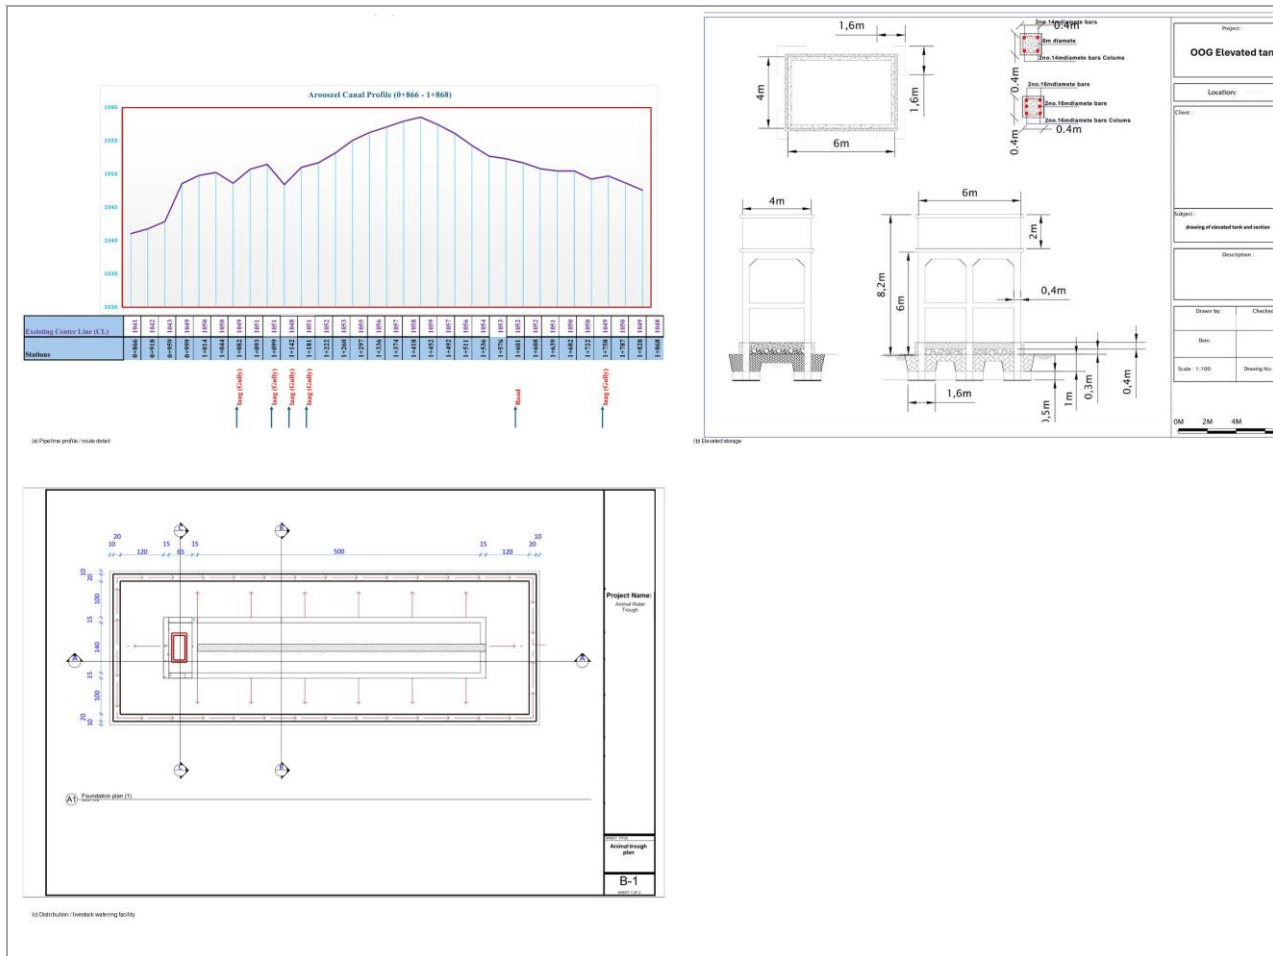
Typical Pipeline Pumping, Storage and Distribution Arrangement
